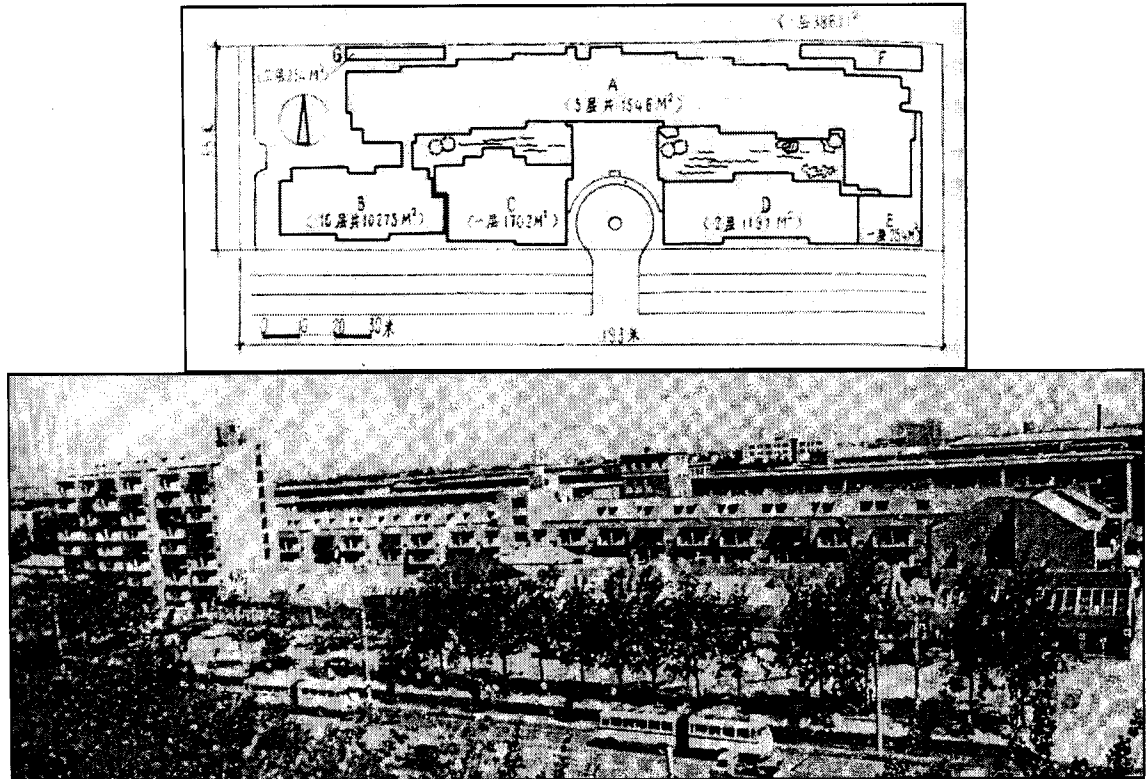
Jianguo Hotel, site plan and view on Chang'an Avenue, 1980-82
